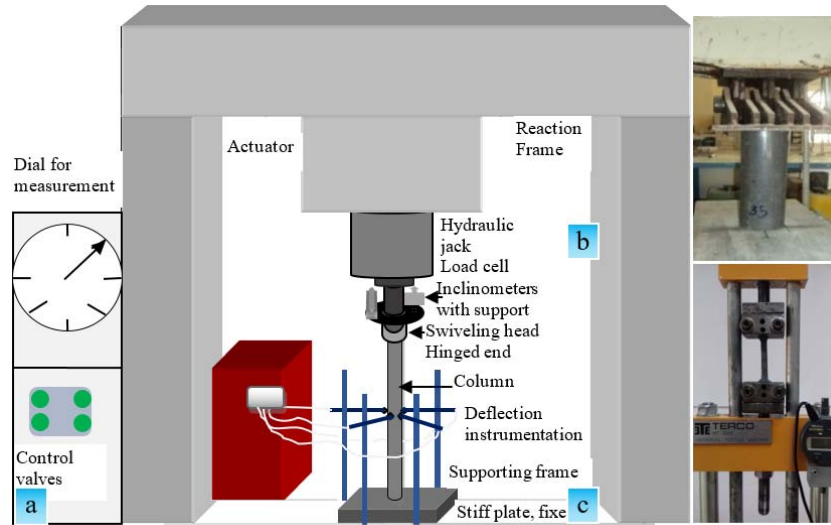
Test setup for (a) slender specimens, (b) stub columns and (c) coupons
